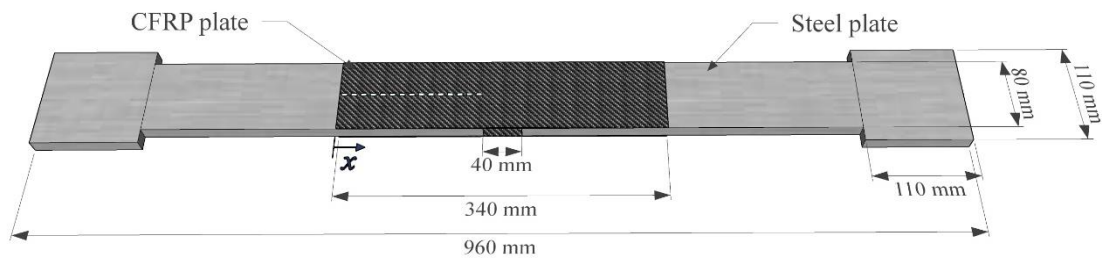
Geometric dimensions of the double-lap bonded joint
